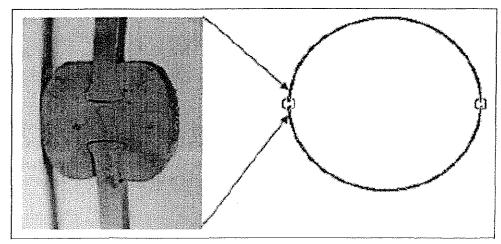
Lock-Bar steel pipe connection, circa 1911.
